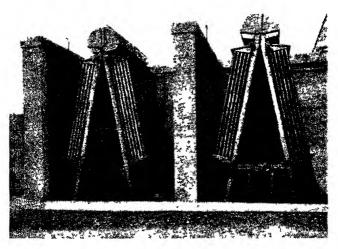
Cooling radiators beyond the division wall in similar compartments to Fig. 89. Water fire-fighting equipment
